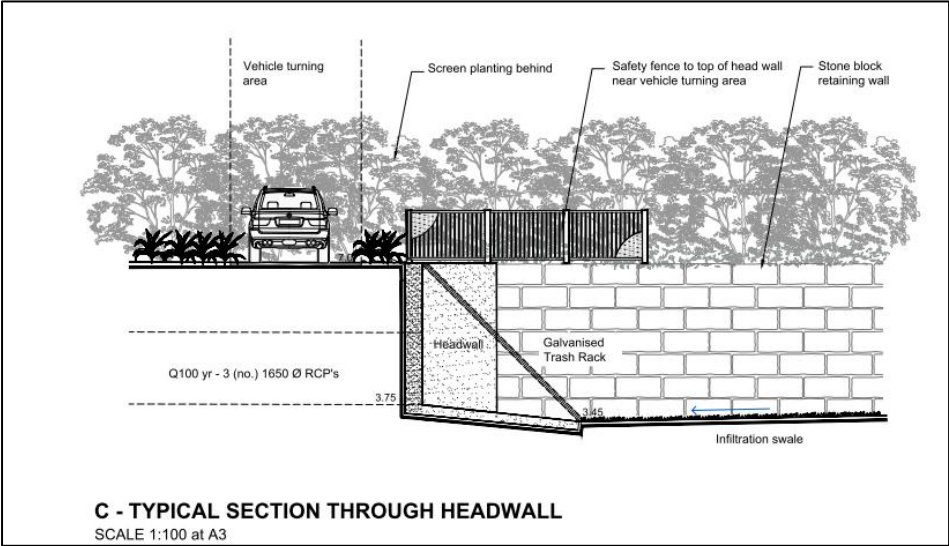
Concept Details of Retaining Wall At Transition From Swale To Pipework
